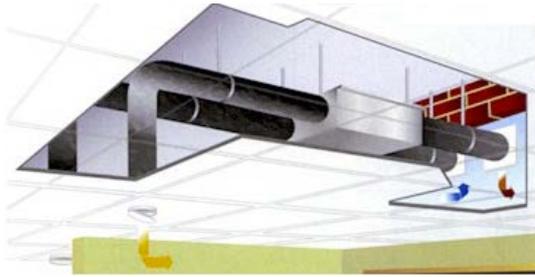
Illustration of MVHR Xcell 600 installed in ceiling of bathroom
